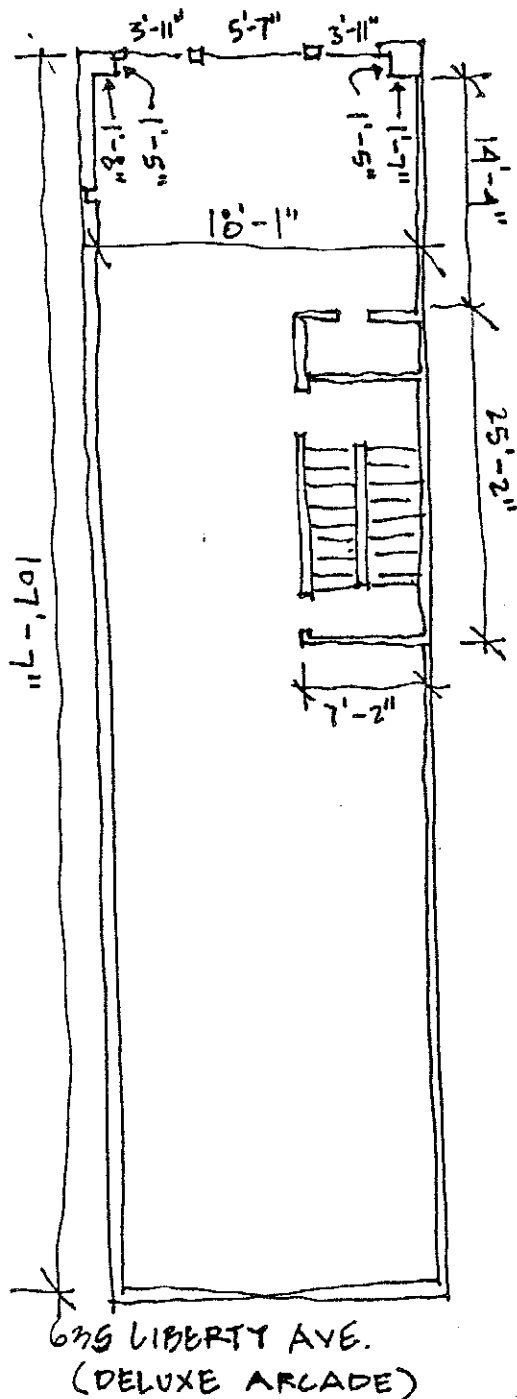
Sketch plan of 635 Liberty Avenue, by John Bertola and Philip Snyder, of Kingsland, Bauer, Havekotte, Pittsburgh, PA.
